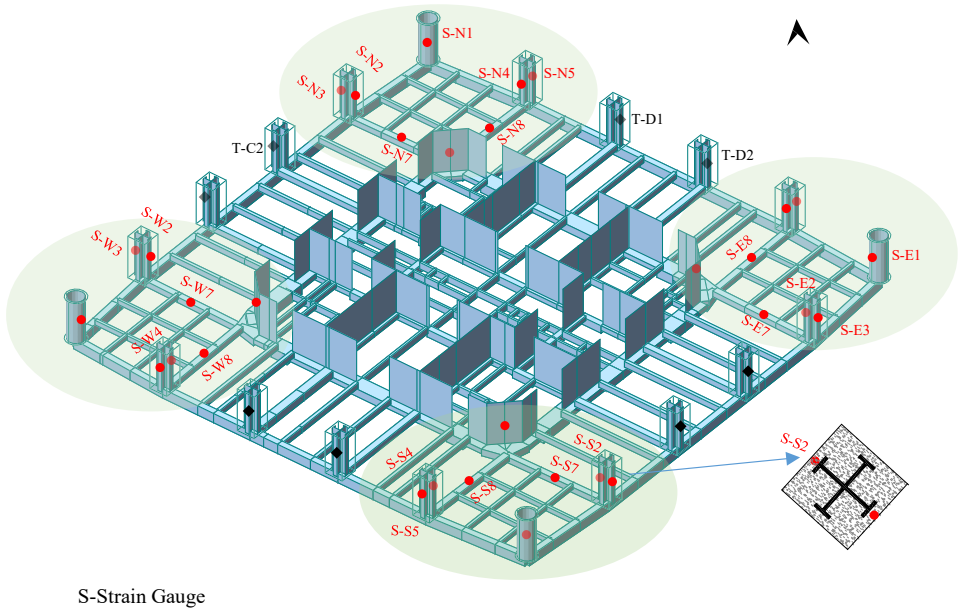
(b) shows the typical floor of this skyscraper. The floor section has a constant size of 50.6 m  $\times$  50.6 m, surrounded by 20 columns consisting of 4 concrete-filled tube (CFT) columns at the corners and 16 square steel-reinforced concrete (SRC) columns in the middle of each facade. The inner core tube is a square with the dimensions of 30.0 m  $\times$  30.0 m. The core tube and the columns are connected through concrete beams.
